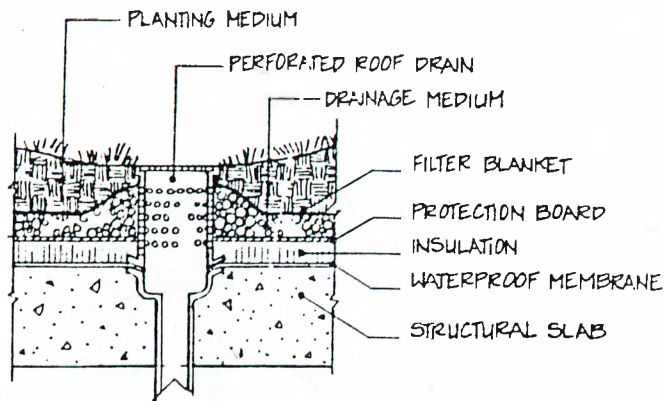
Roof Drains for Flat Planted Surfaces. On flat planted surfaces, both surface and subsurface drainage is accomplished with perforated roof drain flush with planting medium. Filter blanket prevents seepage of planting medium into the draining layer.
